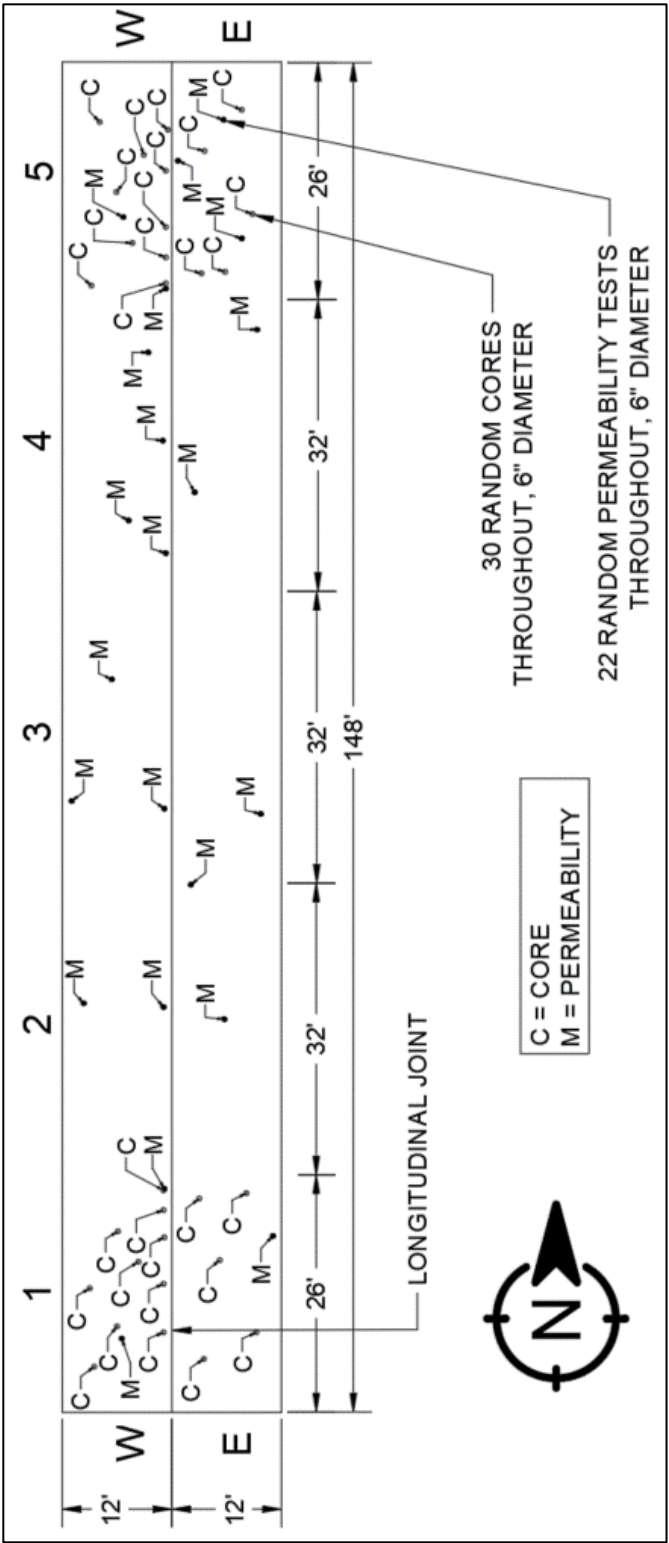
Coring and permeability testing plan (“ corresponds to inches and ‘ corresponds to feet)
